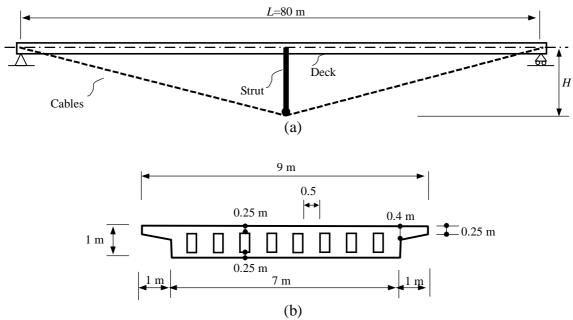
An under-deck cable-stayed bridges analyzed: (a) elevation; and (b) cross section of deck
